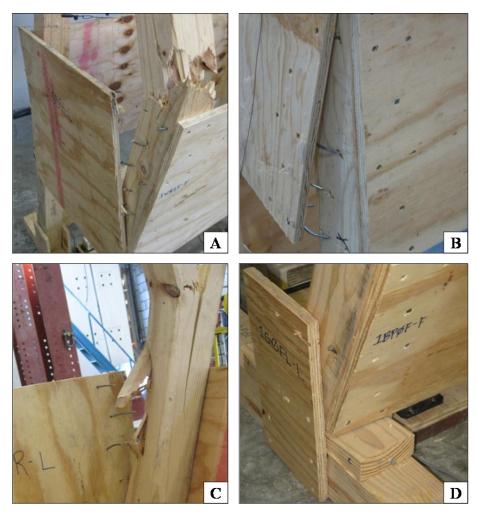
Connection Failures A) Pull Through B) Pullout C) Post Splintering D) Half-Gusset Rotation and Pull Through
